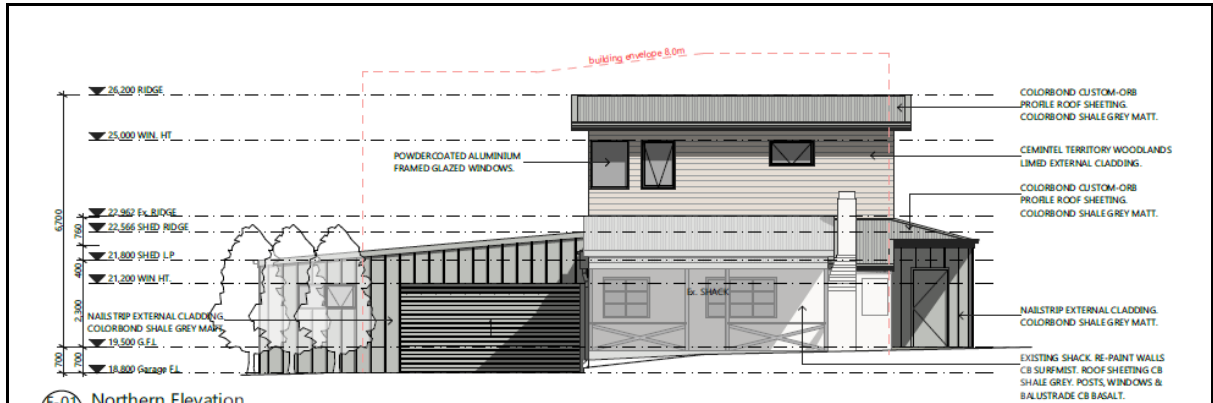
Proposed Extension, viewed from Davies Street (Cataract Designs, 2021).
